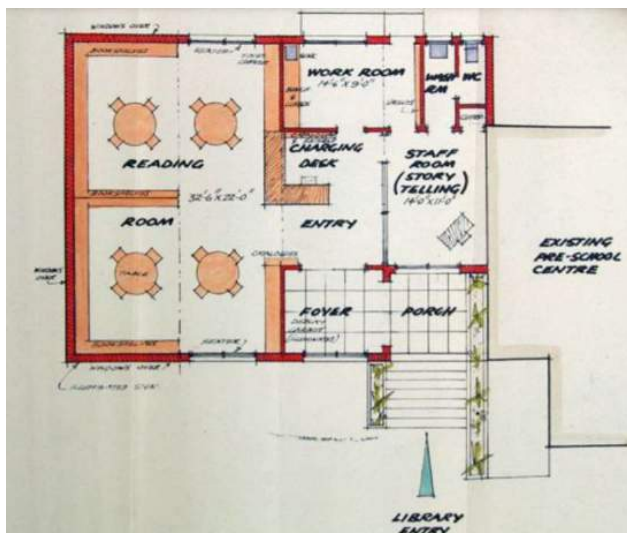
Sketch plan for the Children's Library prepared by local architectural designer David L Woodger in June 1960, showing existing pre-school building to the right. (Source: Public Building Plans File No.5841 Plan No.4057, Unit 413, VRPS 8044, PROV, cited in Mills and Westbrooke 2010: 15)
